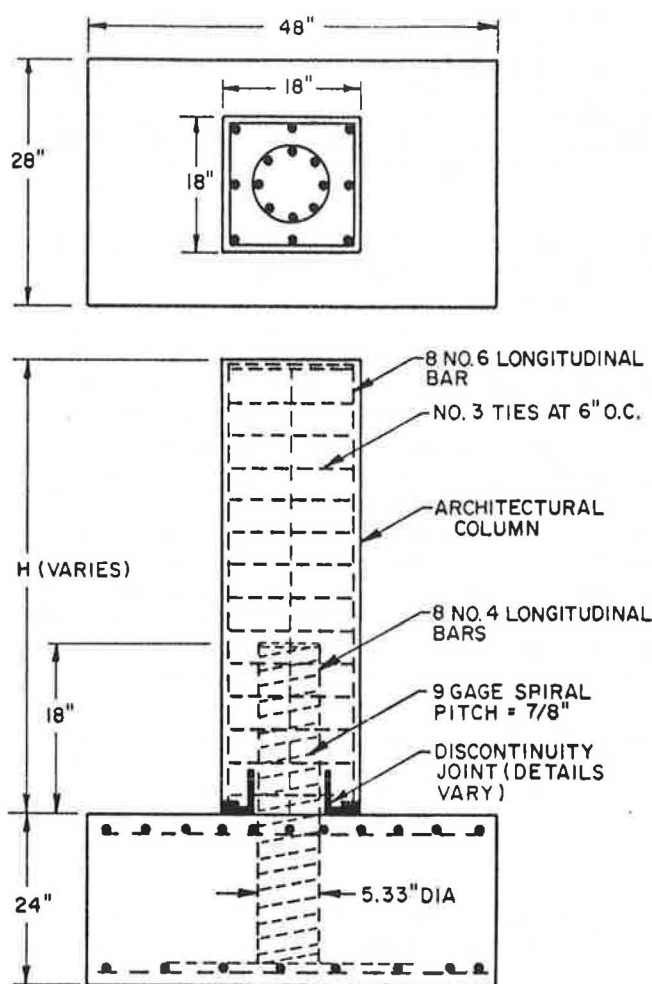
Typical dimensions and reinforcement of the column specimens.
